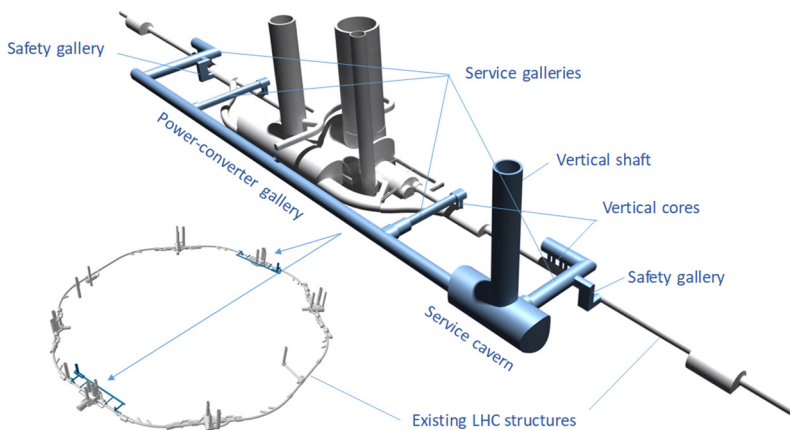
Typical HL-LHC underground civil engineering structures at Point 1 and Point 5.
